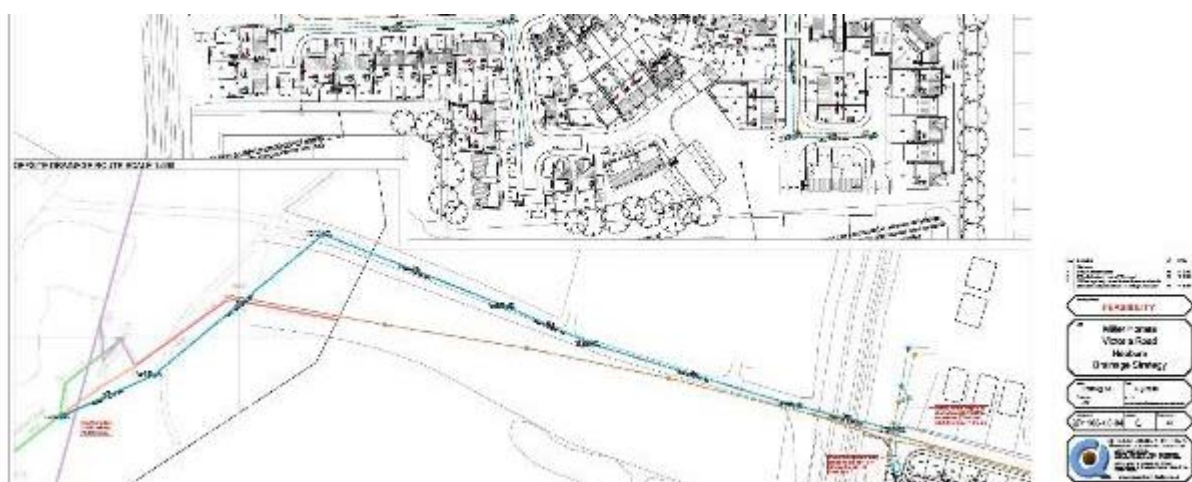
PROPOSED OFF SITE DRAINAGE ROUTE
